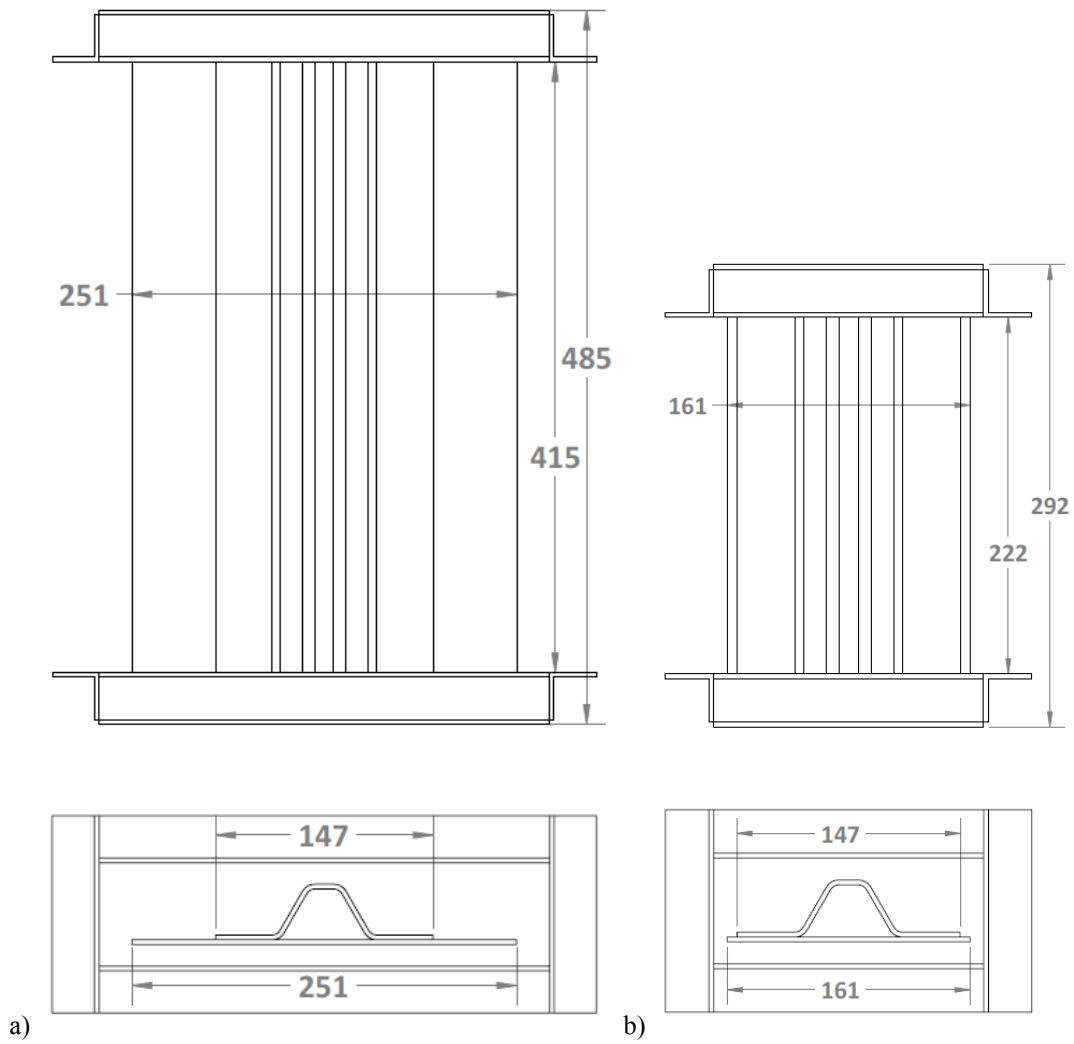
Compression specimen design. a) Flange-impacted compression specimen and b) cap-impacted compression specimen
